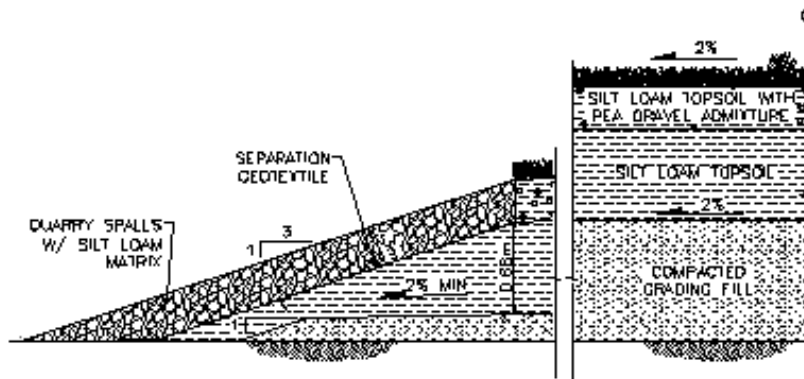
Schematic of Mono-fill U-Plant Surface Barrier Cross Section Showing Layering Detail
